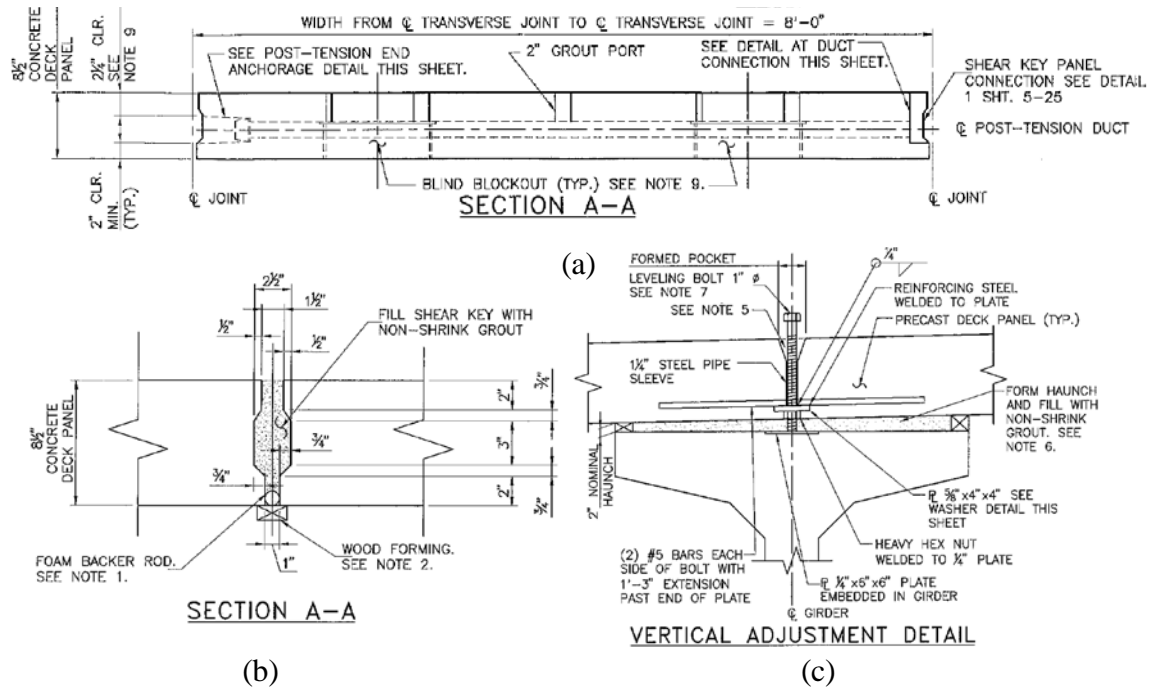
Typical deck details for New Mexico: (a) CIP deck and (b) FDPC deck
